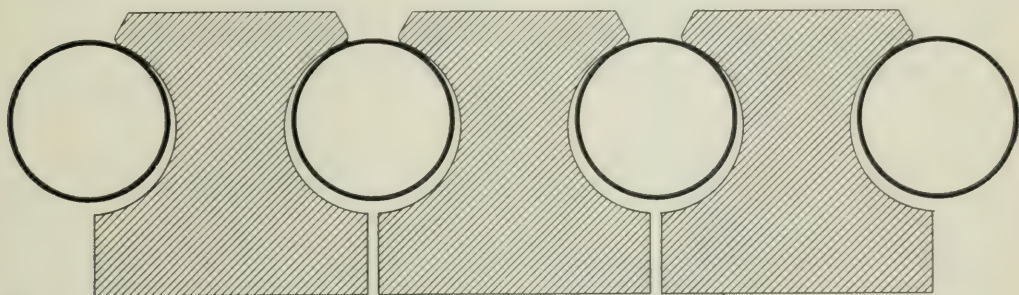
DETAIL OF TILE FURNACE ROOF COMPOSED OF TILES ILLUSTRATED BY FIG. 5.
